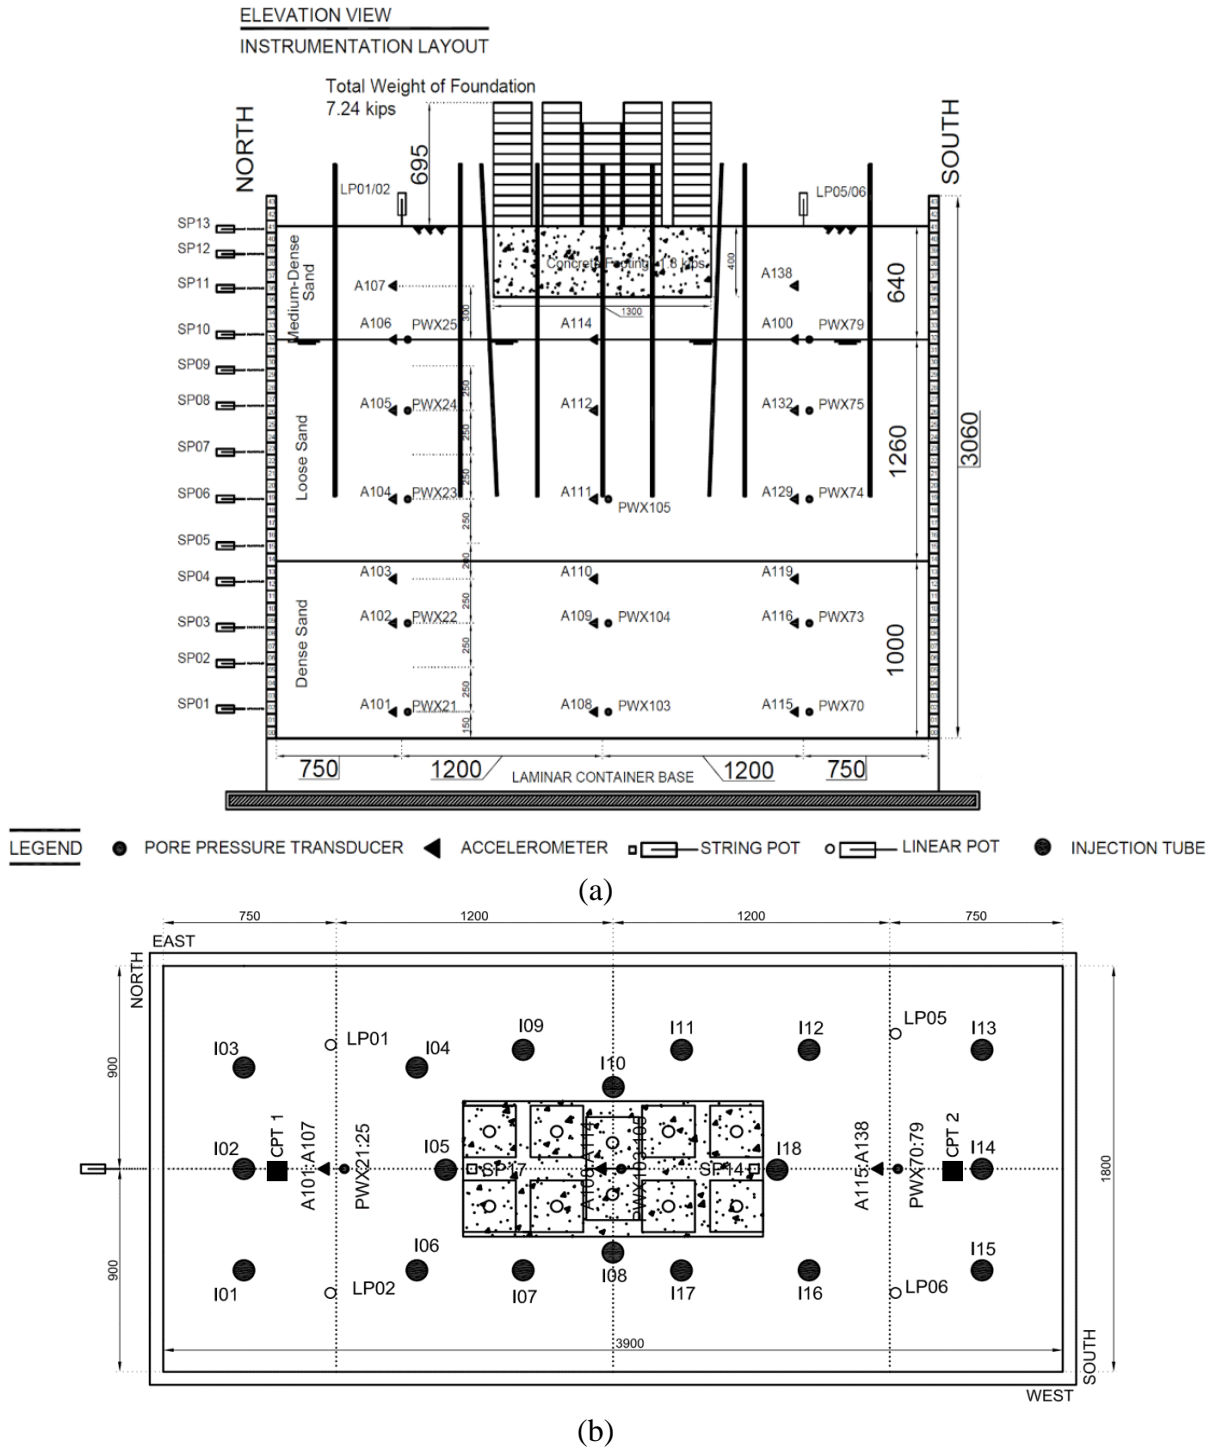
Instrumentation layout of Polymer Test: (a) Elevation and side view, (b) Plan view depicting polymer injection locations (All units in mm)
